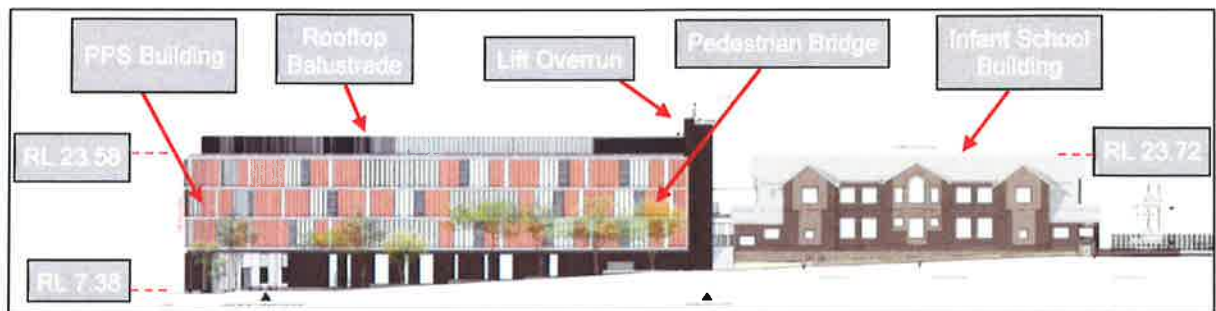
PPS Macquarie Street (Northern) Elevation (source: Applicant)
